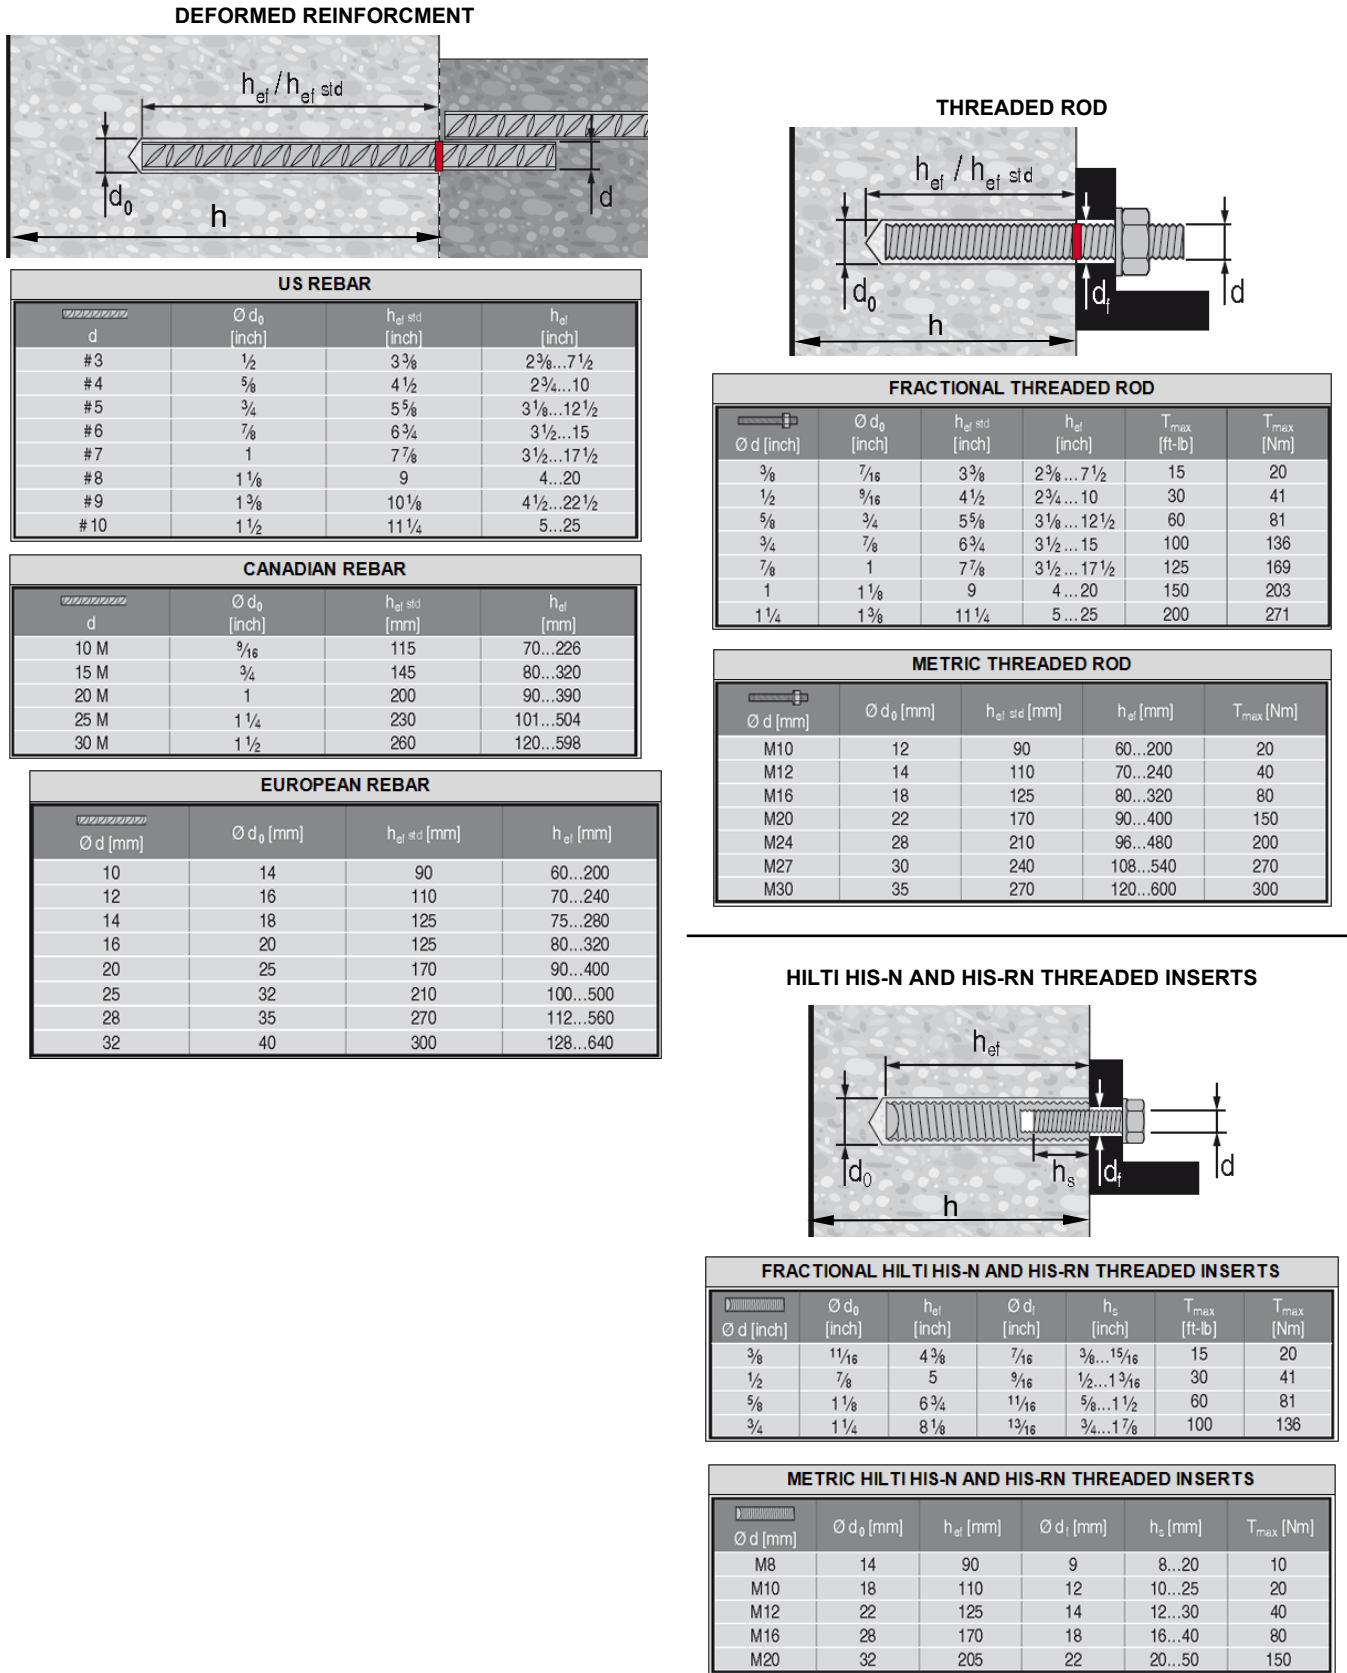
INSTALLATION PARAMETERS FOR POST-INSTALLED ADHESIVE ANCHORS
